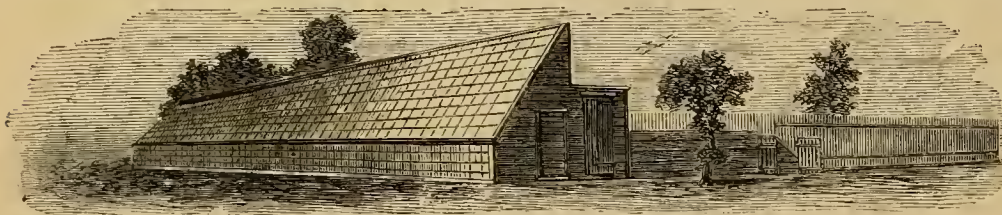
ELEVATION OF MR. WARREN'S FOWL-HOUSE.
